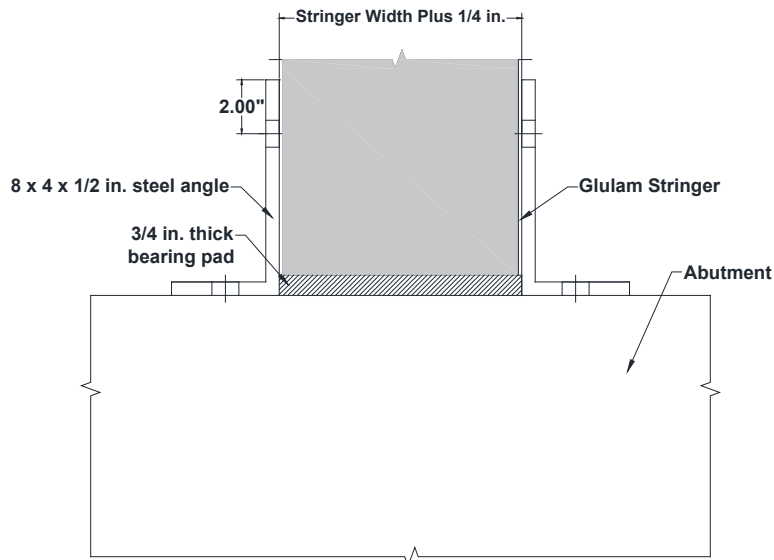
Glulam Timber Bridge Girder-to-Abutment Sample Connection
